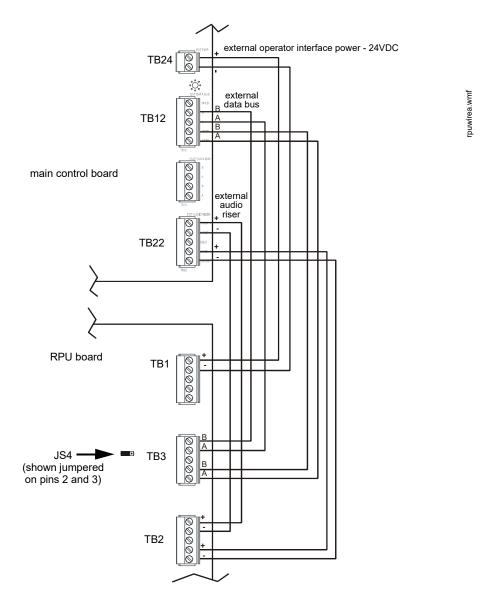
Remote Page Unit Wiring (Class A/Style Z)
